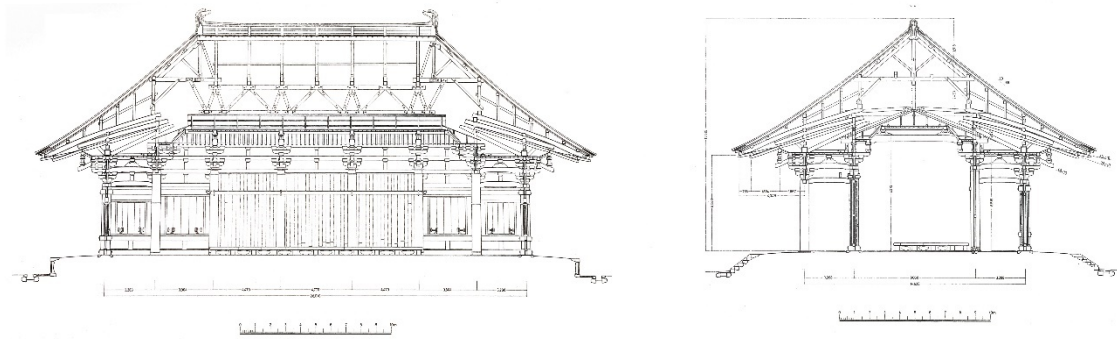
Long Section and Cross Section (Office of Cultural Assets Preservation, 2009)
